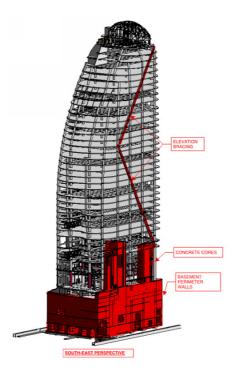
North Tower and Northern Concourse structure perspective describing the integrated design from foundation level to rooftop. The new Sydney Metro tunnels are adjacent to the shaft.
